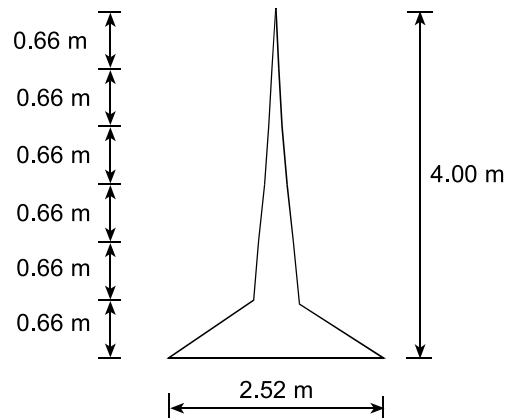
Optimum cross section of a gravity retaining wall with a height of 4 m.
